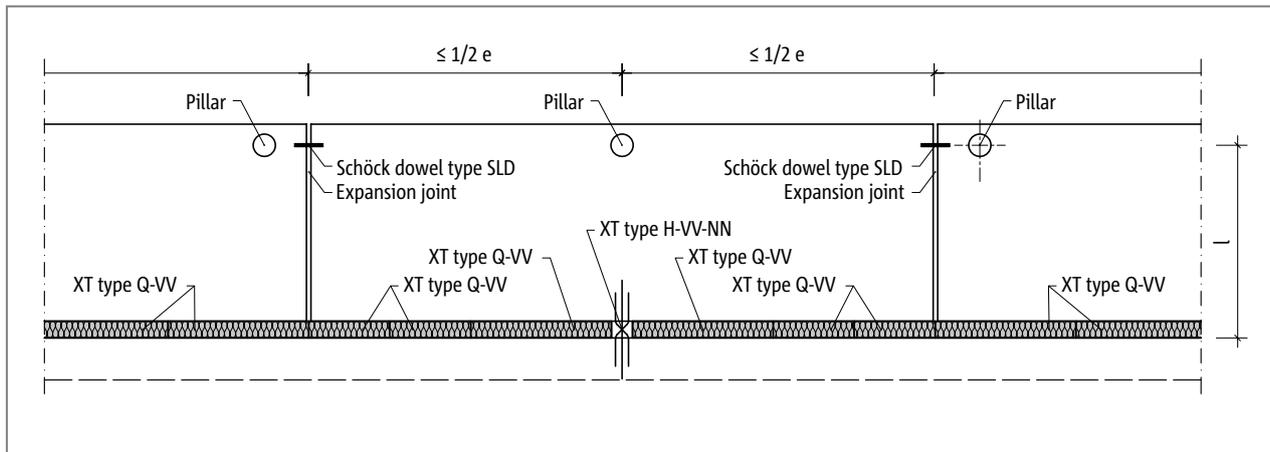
Schöck Isokorb® XT type H: Expansion joint arrangement
